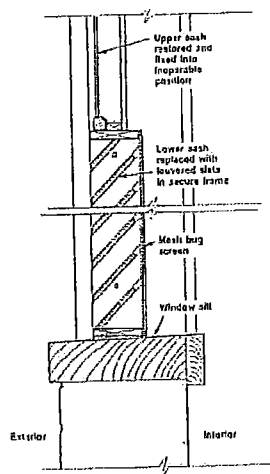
Heavy duty wooden slated louvers were custom fabricated to replace the deteriorated lower sash. The upper sash were rebuilt to retain the historic appearance and to allow light into this vacant historic building. Refer back to Fig. 1 for a view of the building. Photo: Charles E. Fisher, NPS. Drawing by Thomas Vitanza.
